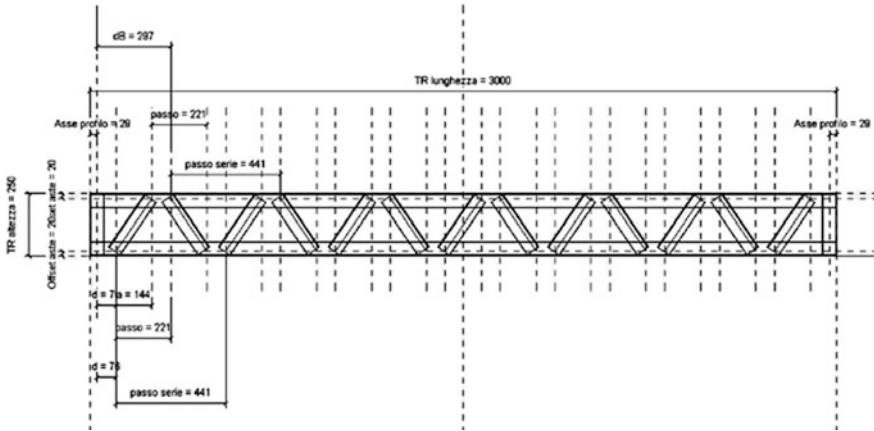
Geometric parameterization of the steel framed trusses. Author Lewis Dal Magro
